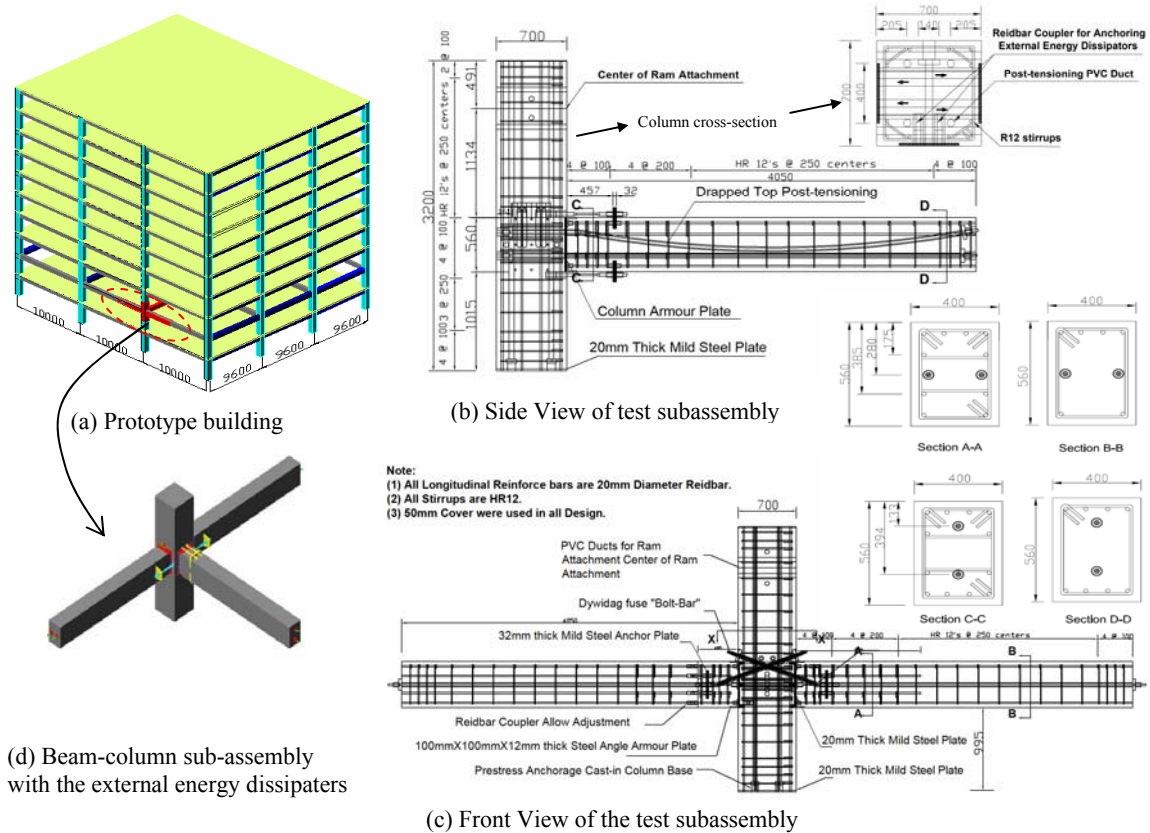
Prototype Building structure and Reinforcement details of subassembly.
